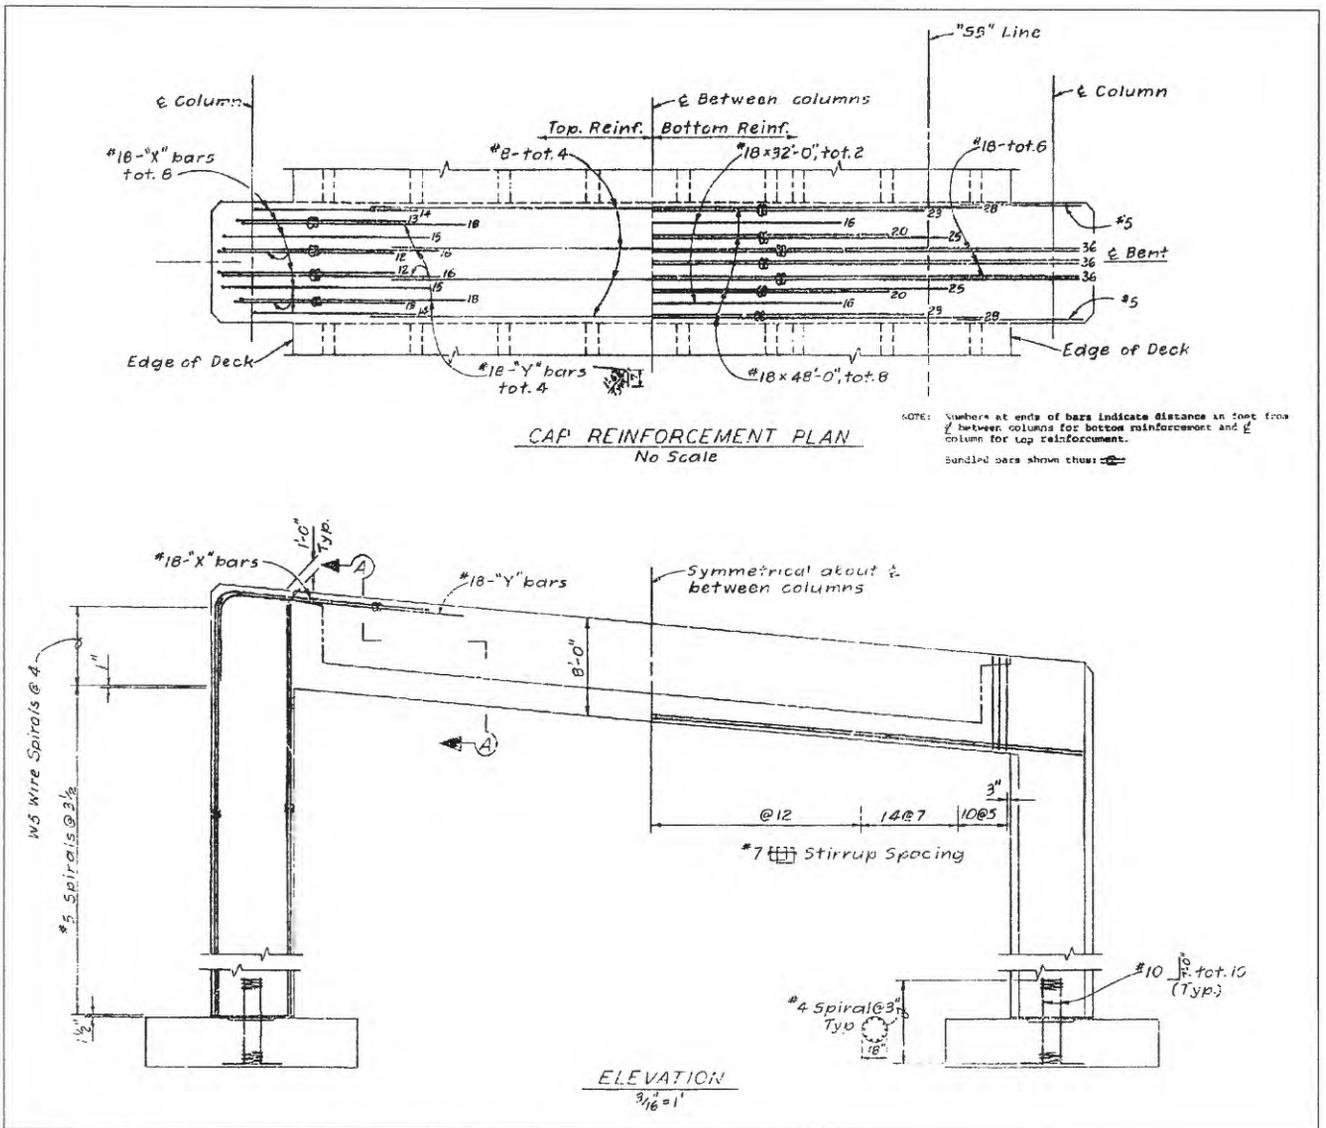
Reinforcement details for Bent 38 of Route 980 Southbound Connector.
